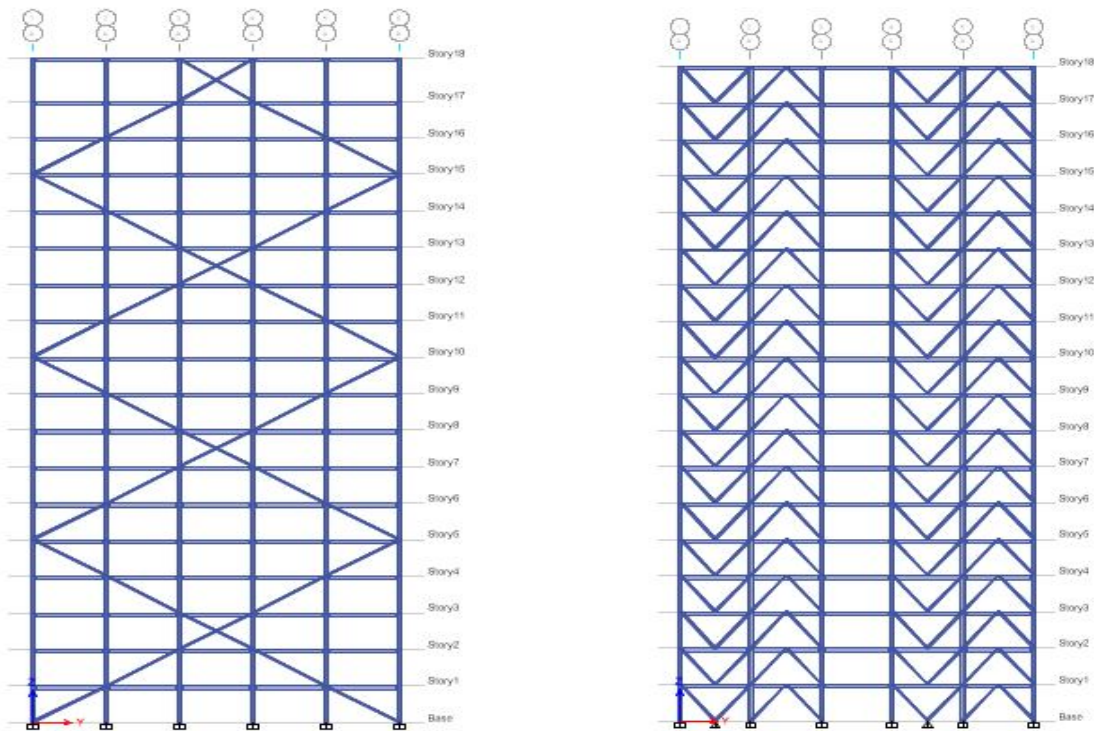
Elevation of Steel Frame with megabracing and Combination of Chevron and V bracing
